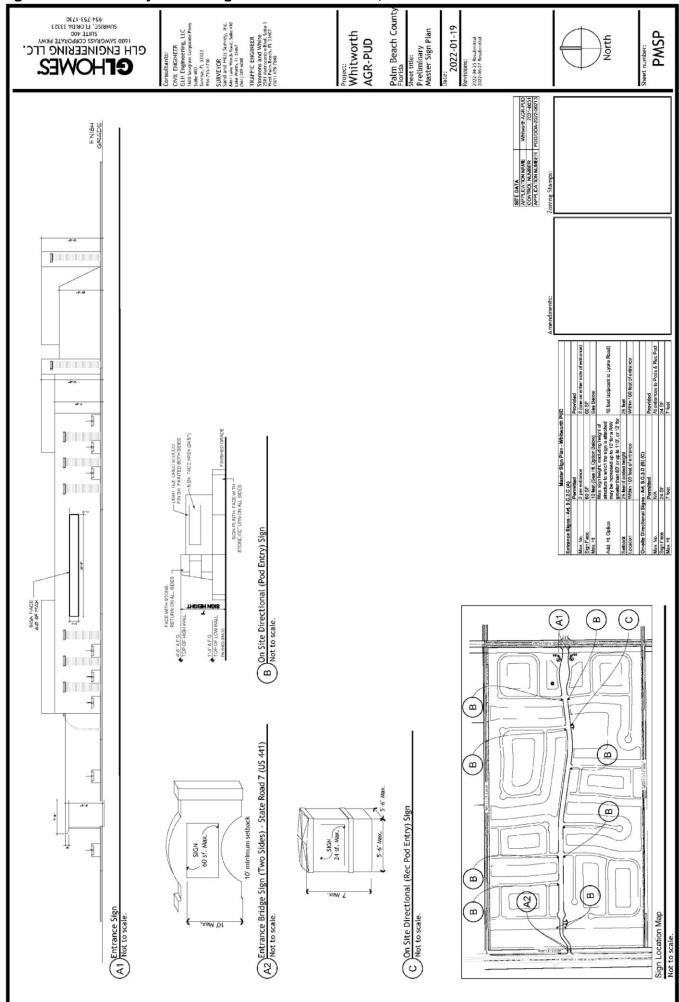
Preliminary Master Sign Plan dated June 27, 2022
